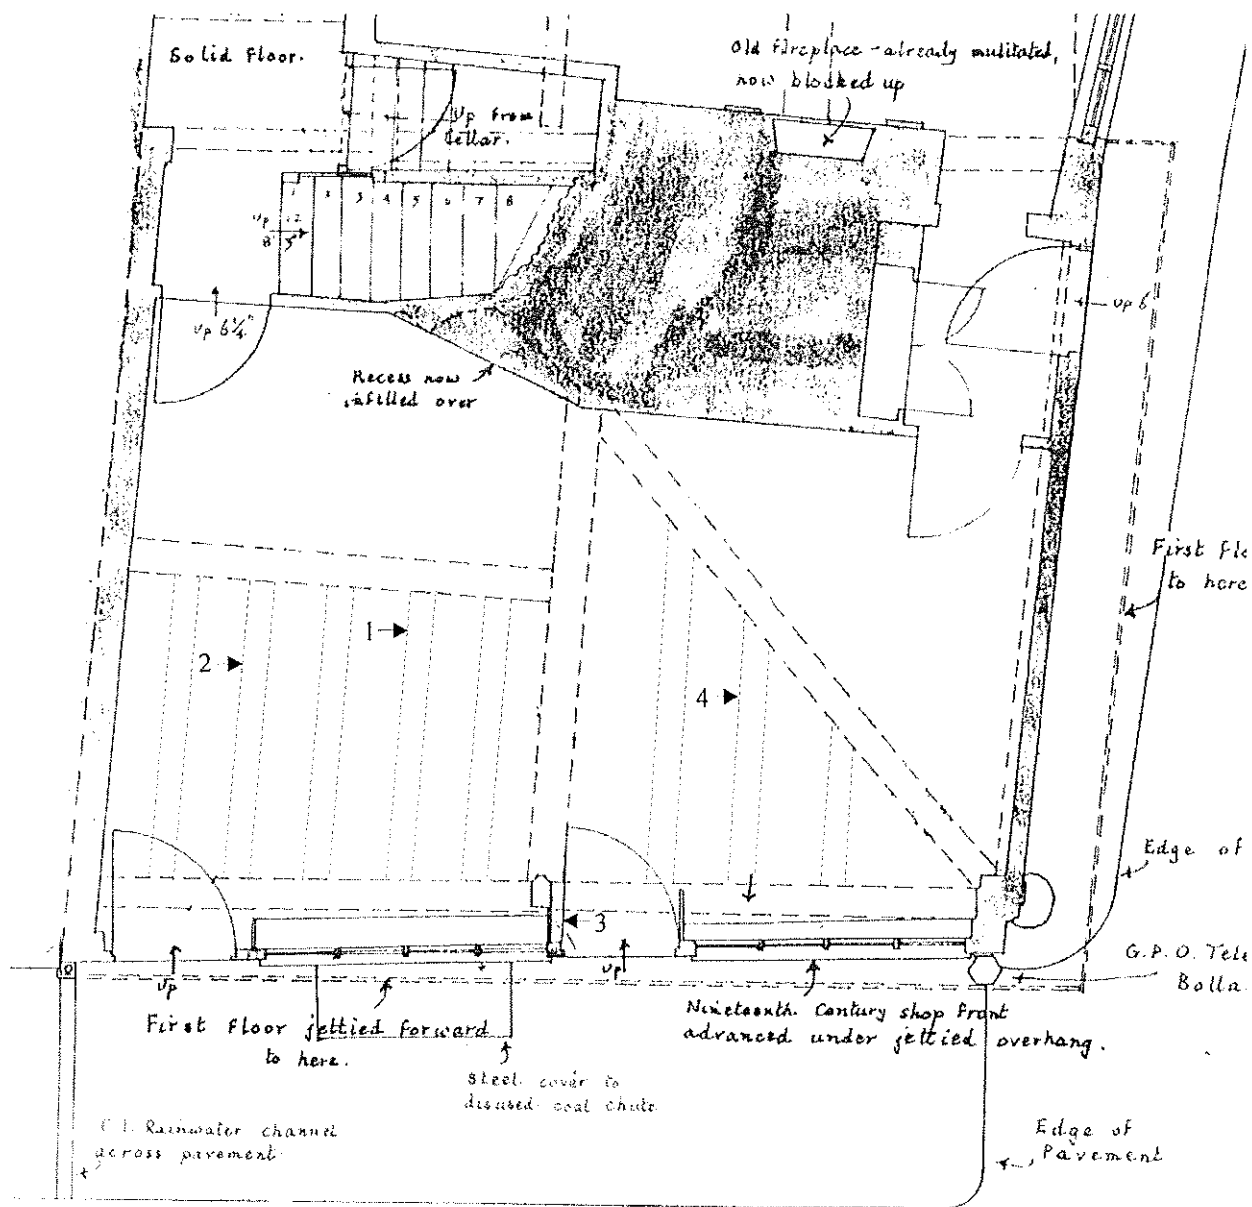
Location of samples 1-4: Joists and beam in ground-floor ceiling/first-floor floor
